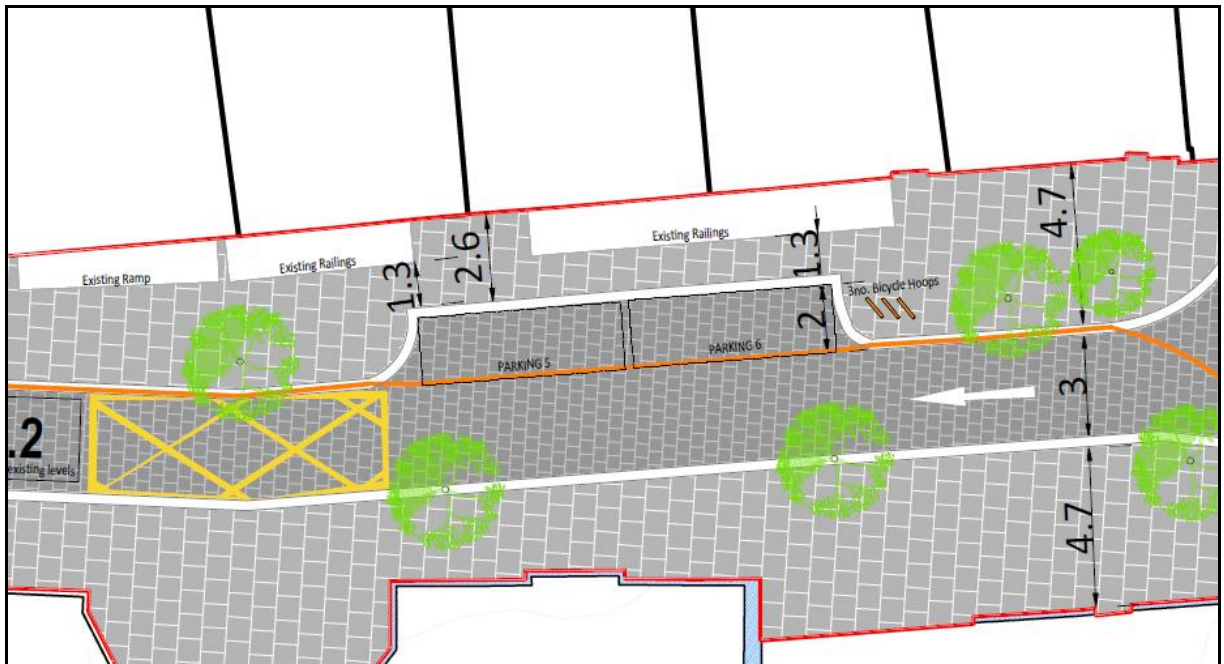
Narrow proposed parking bays on Fair Street with narrow footway adjacent
